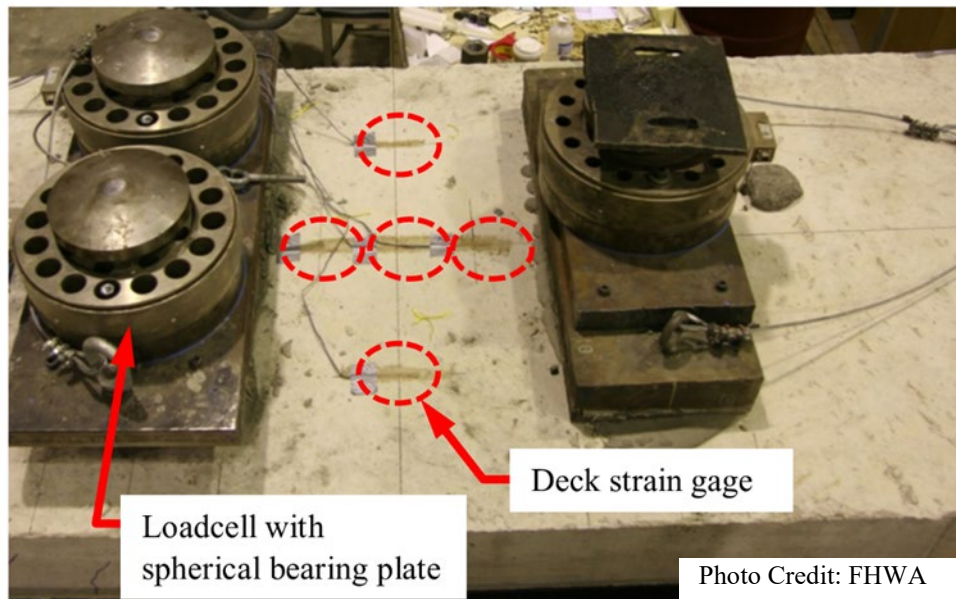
Photo. Concrete Deck Anchors, Loadcells at Deck Reaction Points, and Deck Strain Gauges.
